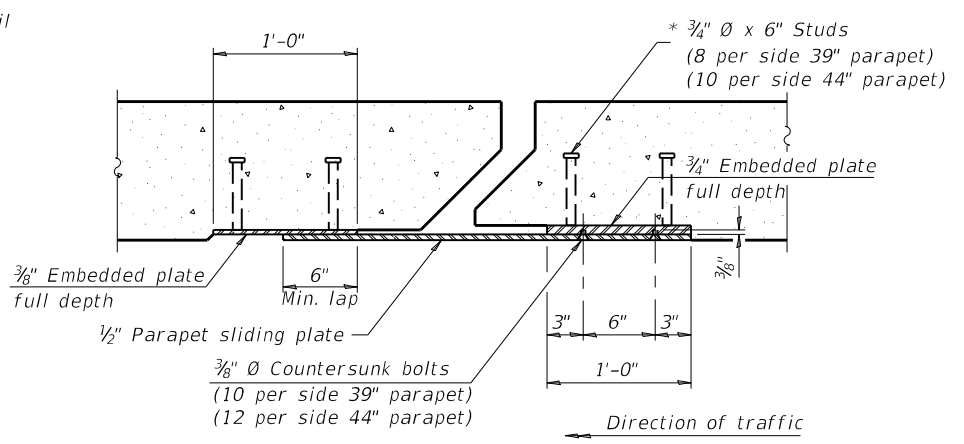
DETAIL OF CONCRETE SUPERSTRUCTURE PIER 2
